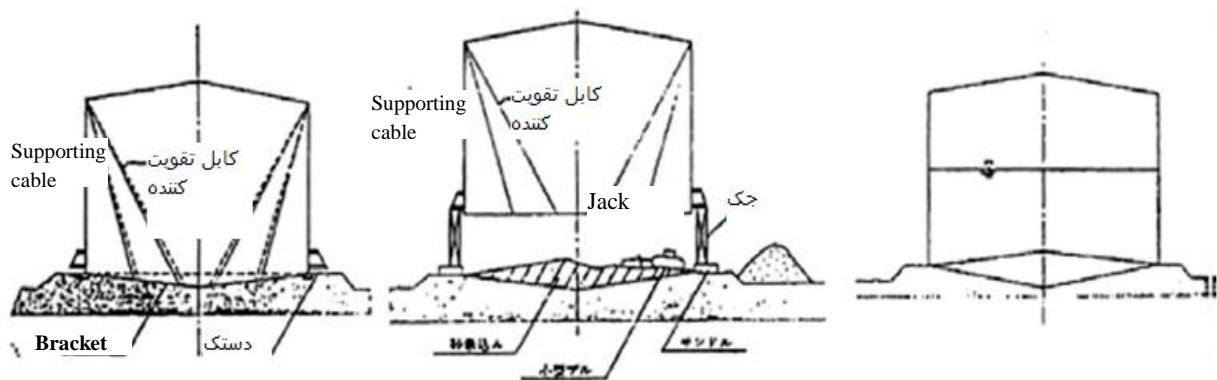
a-b-c Lifting all tank using jacks to repair foundation settlement
